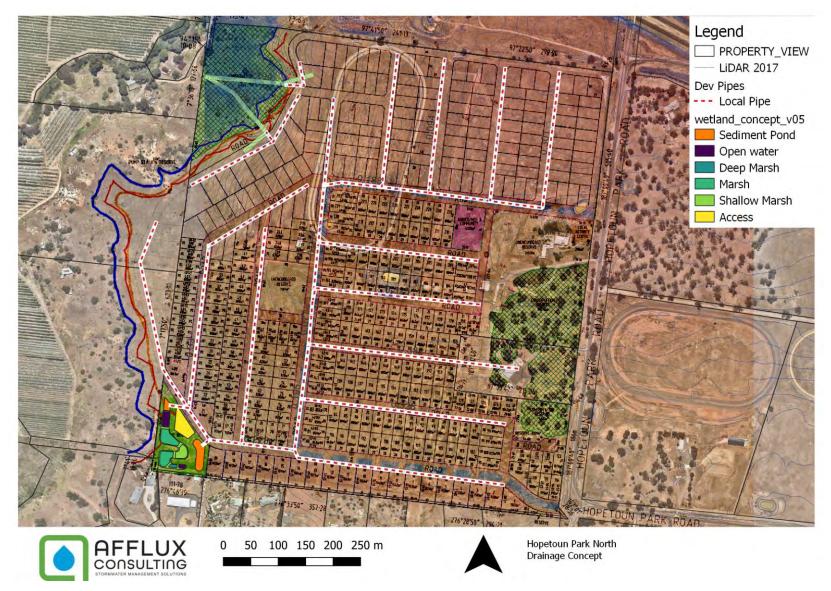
Drainage Development Concept (Note indicative layout only for Stormwater calculations)
